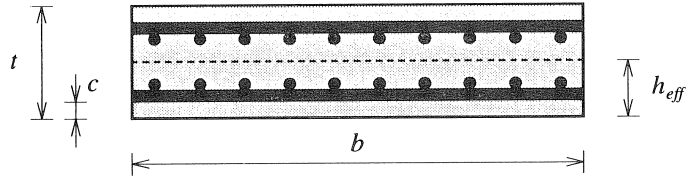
Concrete slab with two layers of reinforcement. Effective tension area according to CEB-FIP model code.
